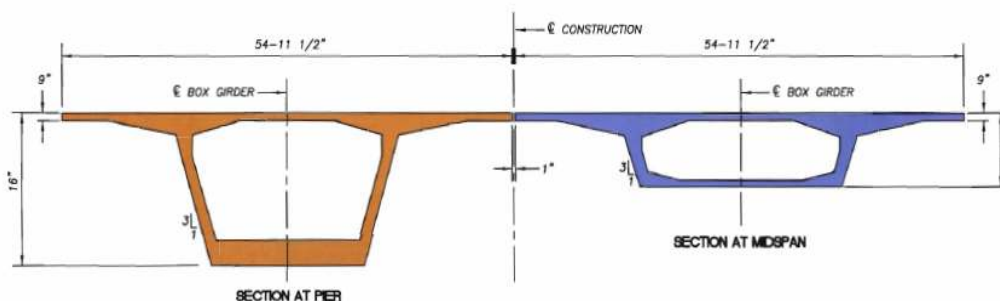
Cross section for typical, twin-girder, superstructure from which the 8' wide, walkway is suspended and centered.
